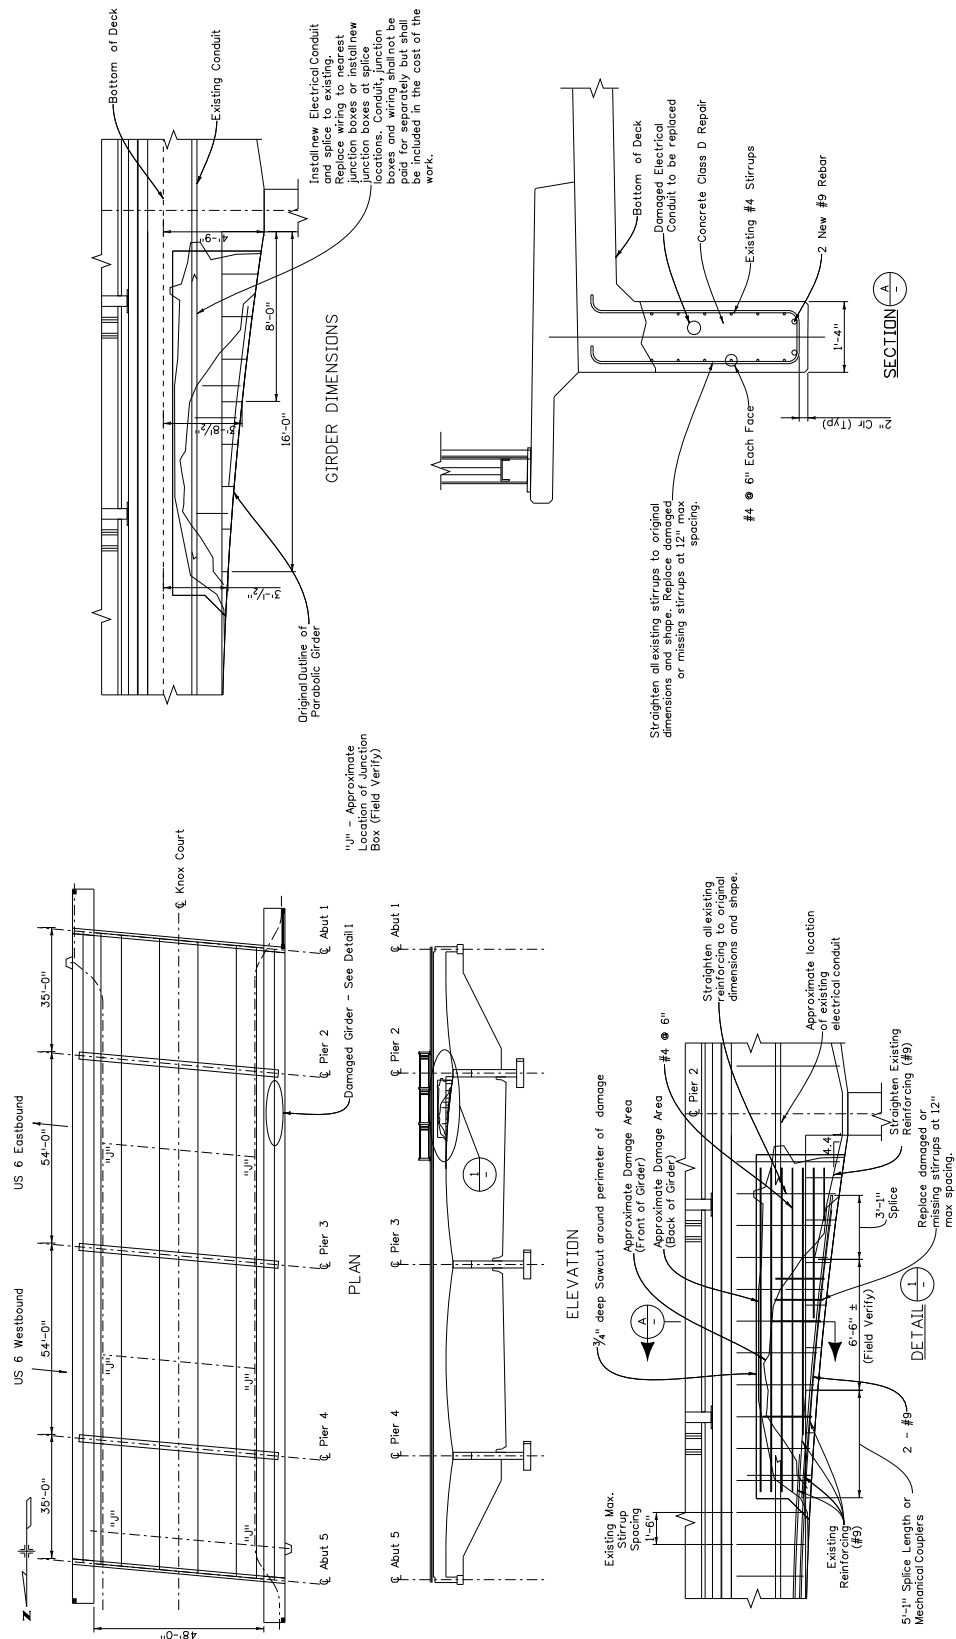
(E)-2 Sample Plan of Concrete Tee Girder Repair
